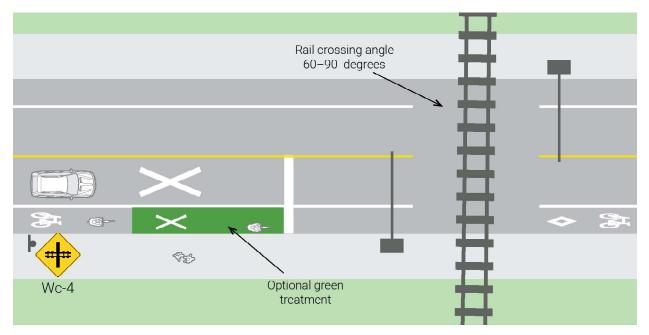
Rail Crossing with On-Road Cycling Facility
